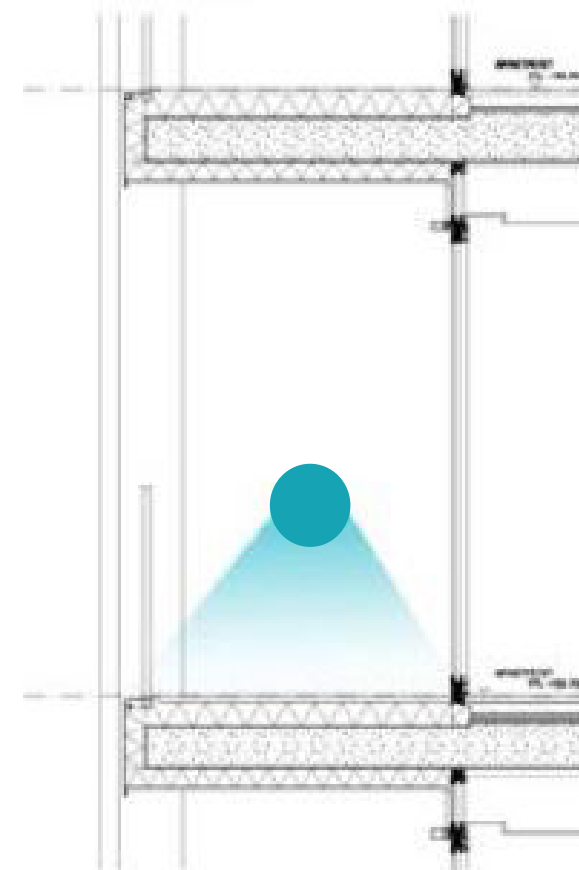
Balcony cross section illustrating wall mounted light fixture
